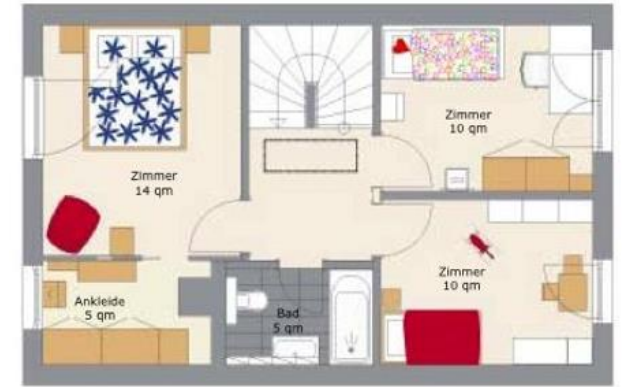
The BoKlok house type at first floor has a plan form that follows the minimised circulation format of the ground floor. Depending on the house type, the upper floor contains either two or three bedroom spaces (Molna and Alsten – 2bedspaces, Jarnbro – 3bedspaces). The location of the main bathroom is directly over the wet room on the ground floor. This allows both floors to share a common service wall. This contains all vertical services for the dwellings.
